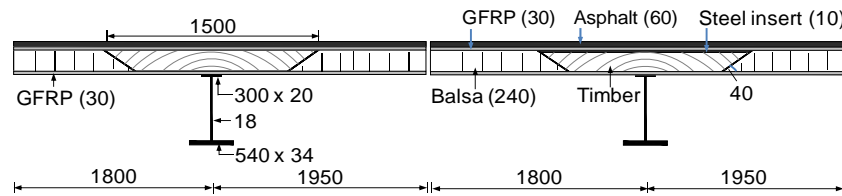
Cross sections of D-TI (deck on left girder) and D-T/SI deck (deck on right girder) bridges (dimensions in mm)
